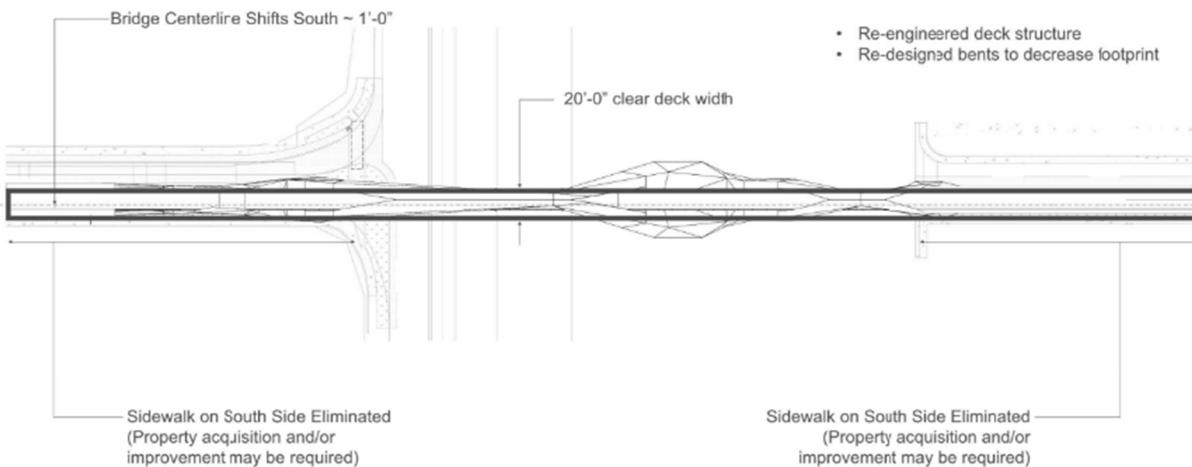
Hawthorne Avenue Concept 1B: 20-foot Deck Width
